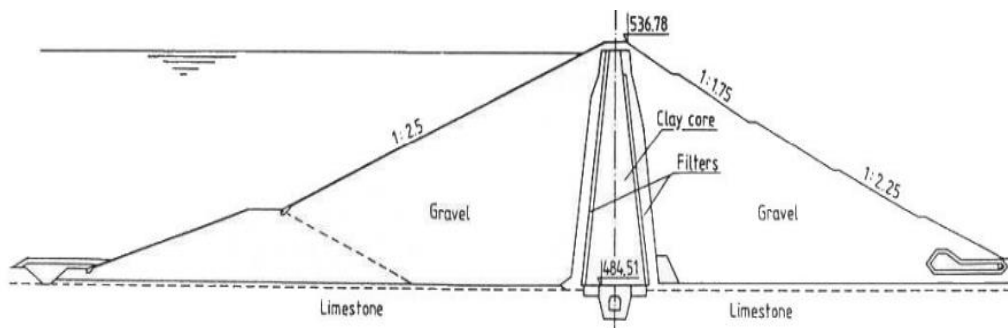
Core shapes and their location in embankment dams' sections (Mirali, 2011)
